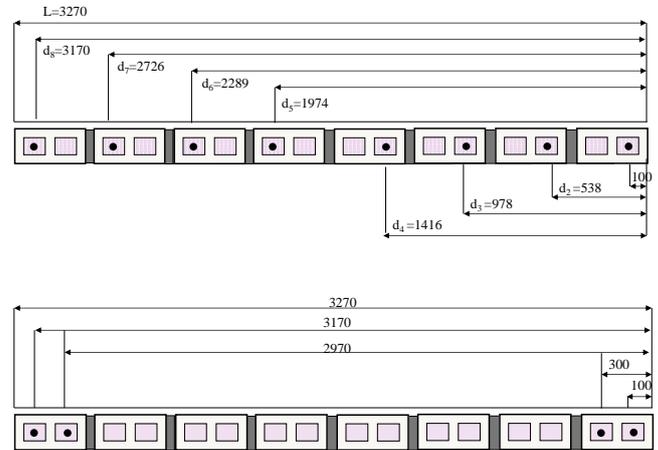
Cross section of wall A uniformly distributed steel and wall B steel at corners
